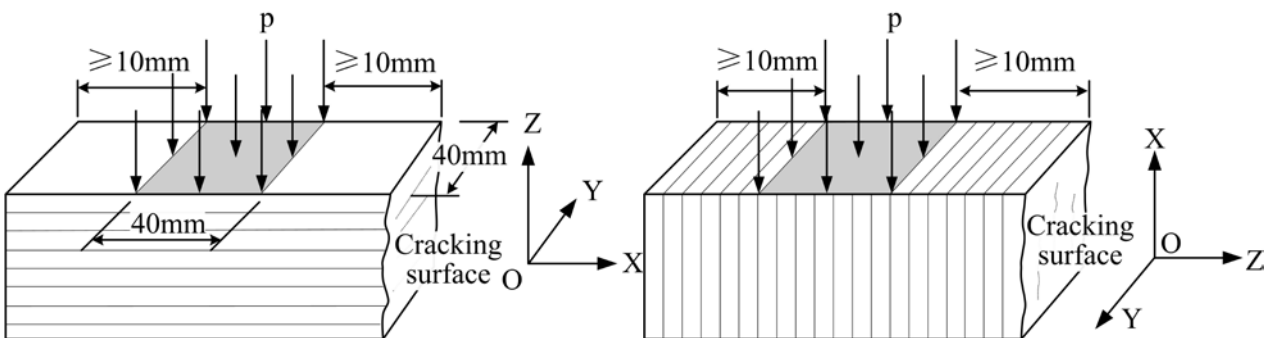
Loading direction of half beams: (a) CZ loading and (b) CX loading
